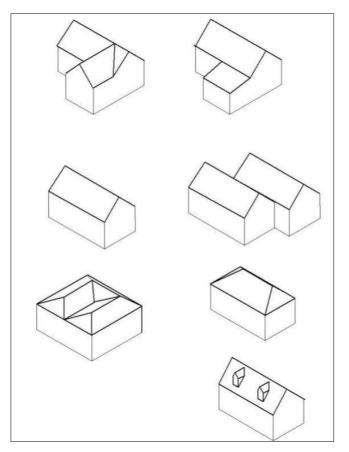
Roof forms as required by clause NOR-S5.7.2 A1
